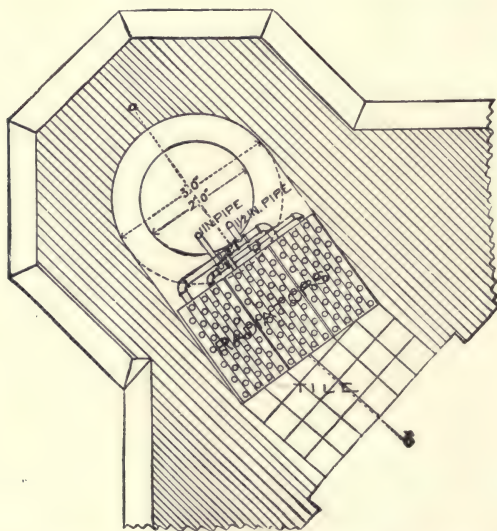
PLAN OF COIL AND EXHAUST SHAFT IN CORNER TURRET.
